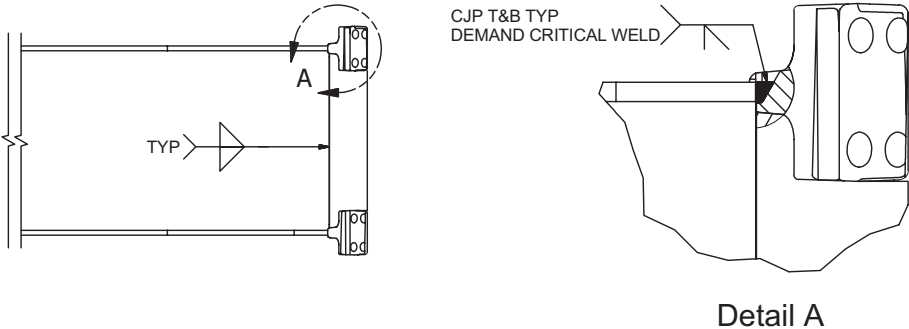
Collar flange assembly-to-beam welds, elevation.
